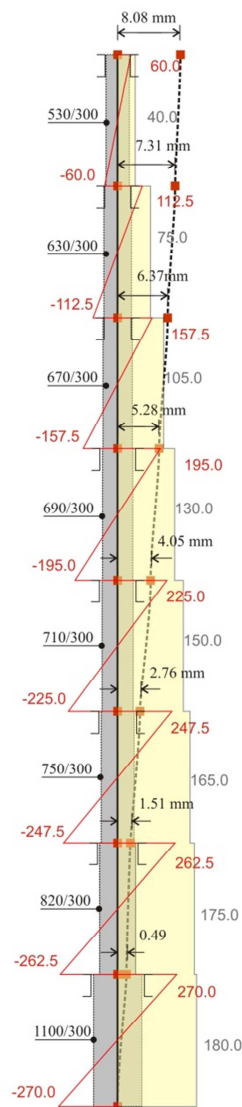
Equivalent structure of one fixed-ended column per storey
